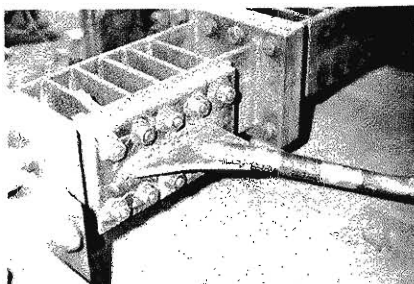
Bending Deformation of Gusset Plate (SPM1)
